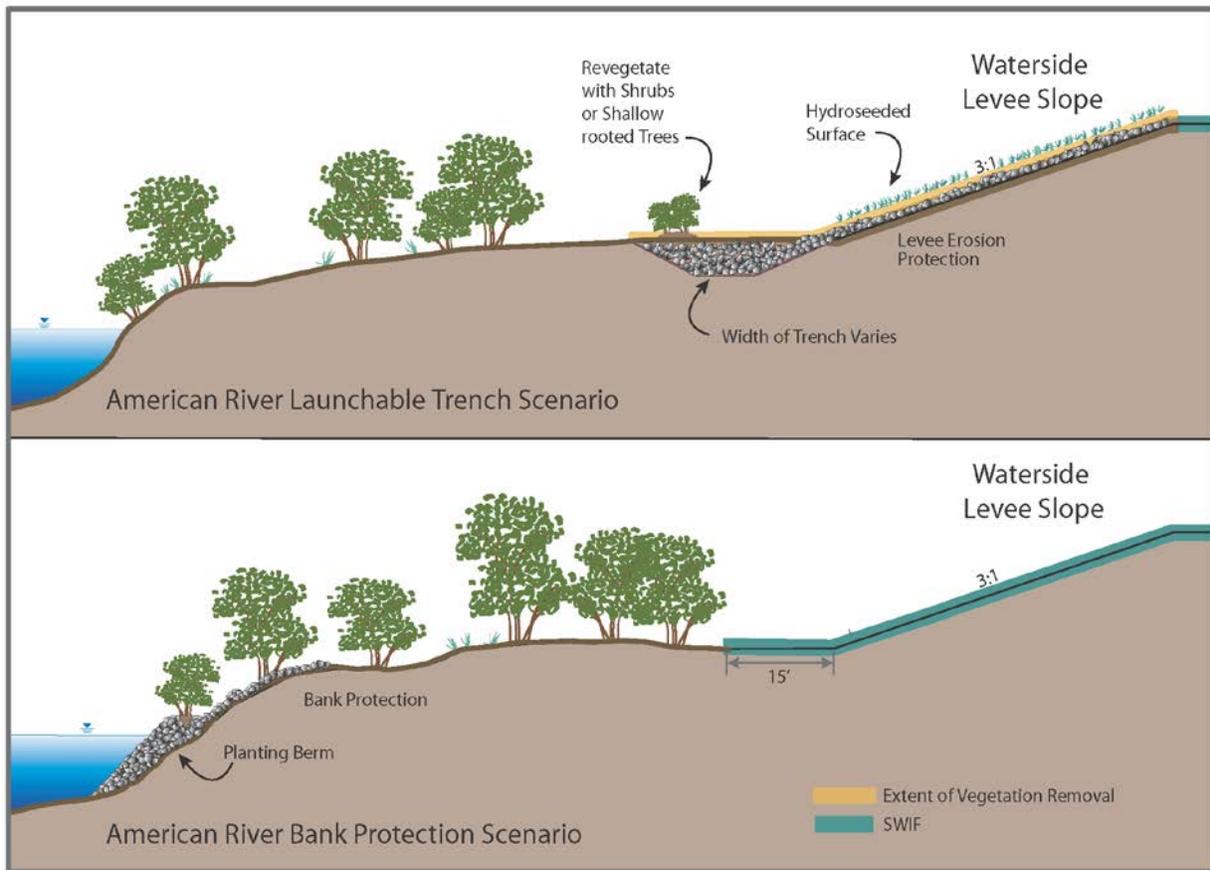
Bank Protection and Launchable Rock Trench Typical Design for American River.
